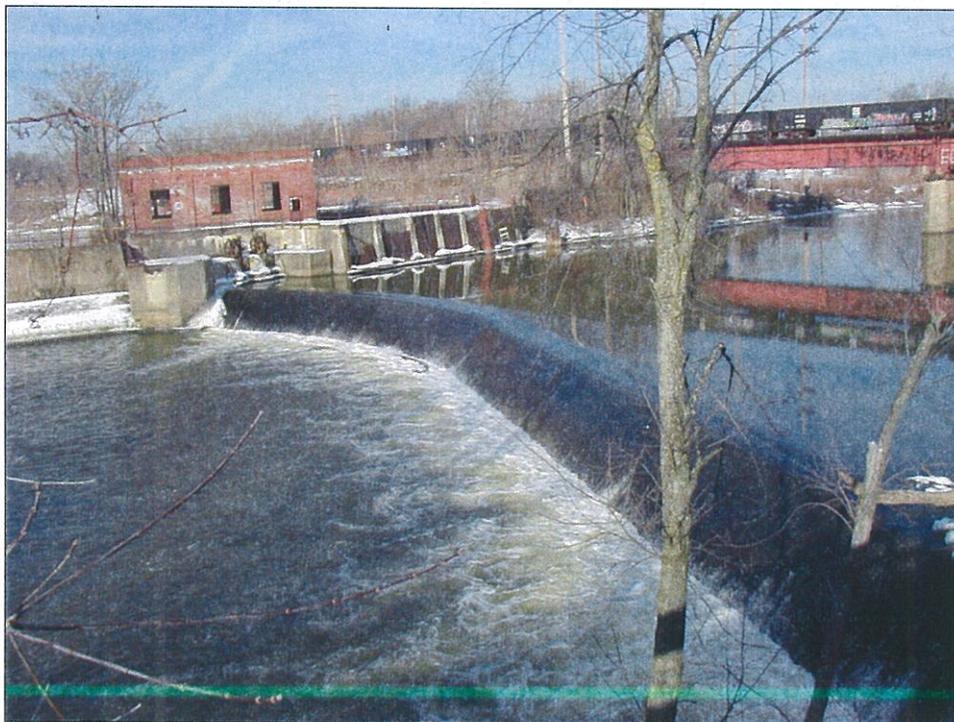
Warren Water Works Dam Looking West. Spillway and screen house are visible on far side of river.
